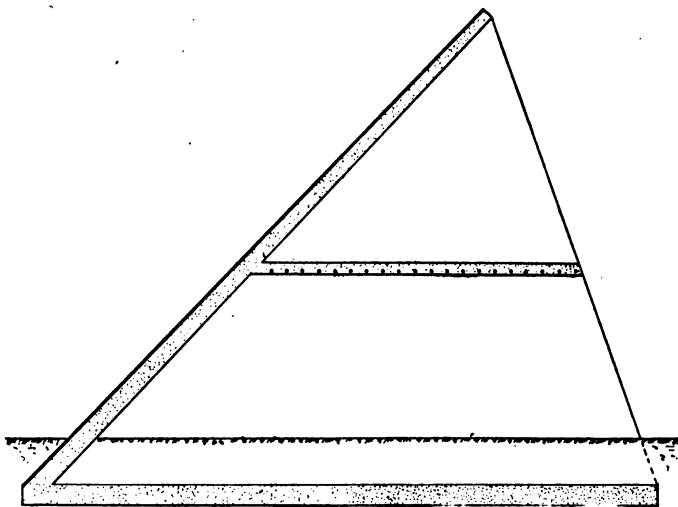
Reinforced Concrete Dam with bracing Platform at Mid-height.
